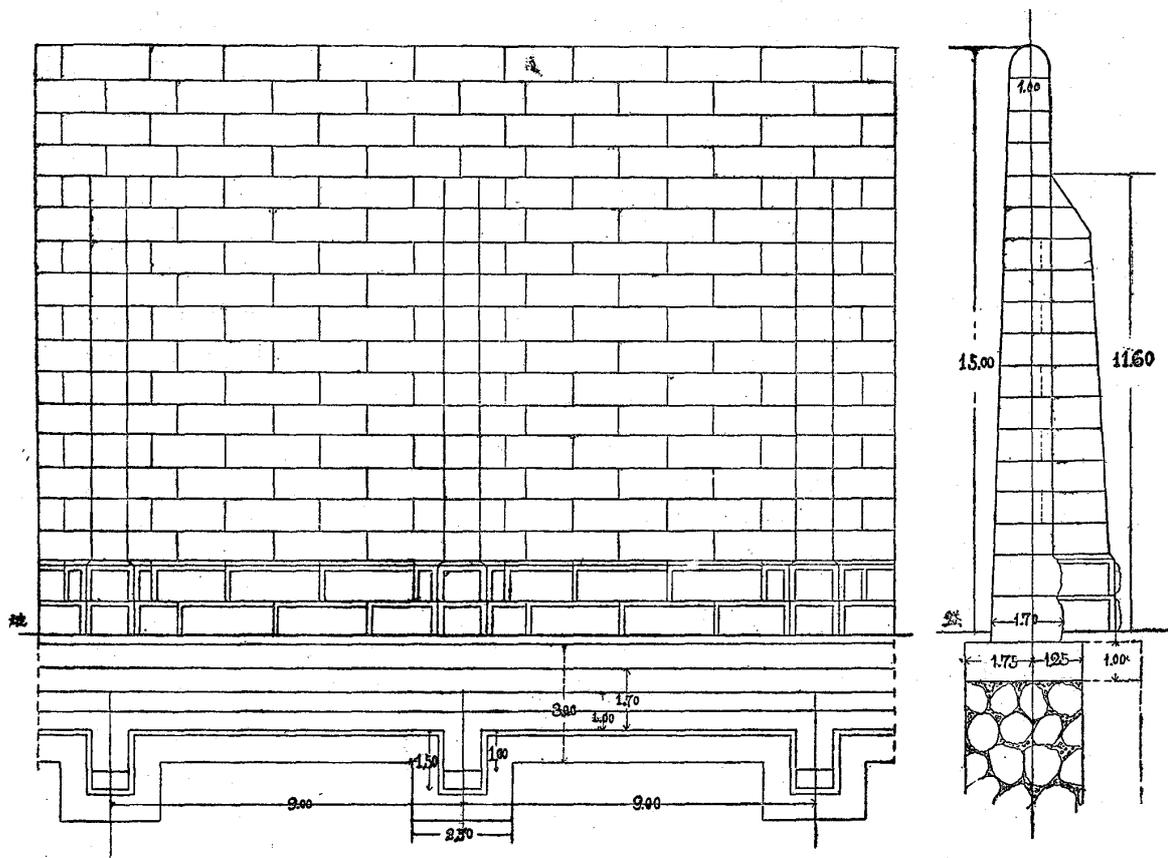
Elevation, Plan, and Section of the Wall of the Kagoshima Prison.
